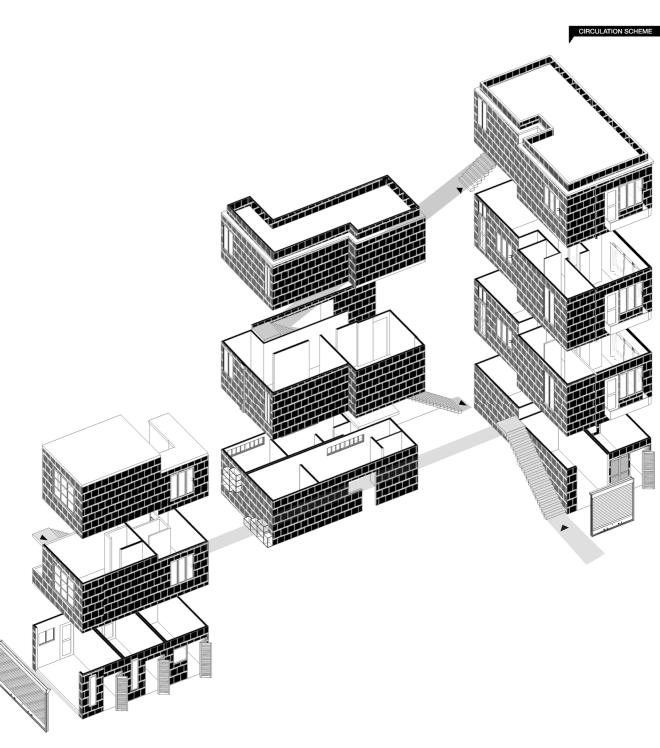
Volumetric division and circulation scheme of the stair house, Illustrations by Author
